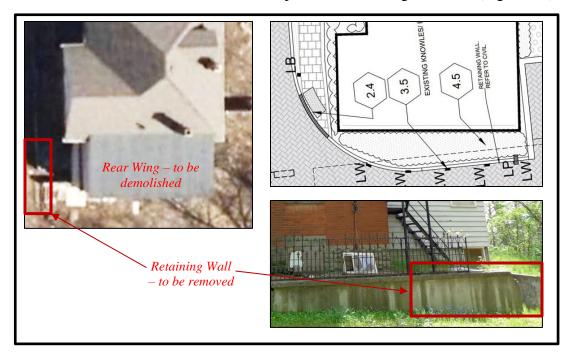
Retaining Wall to be removed – aerial (left), Plan (top right) and 2016 photograph.
